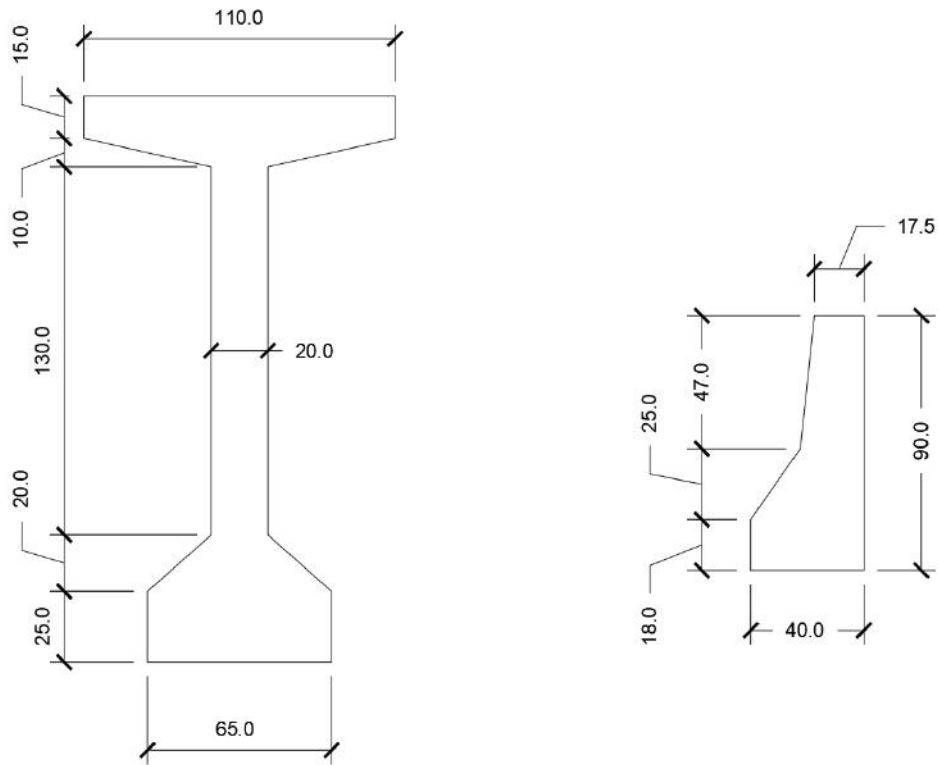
Cross-section of the bridge girders and guardrail (dimensions in centimeters)
